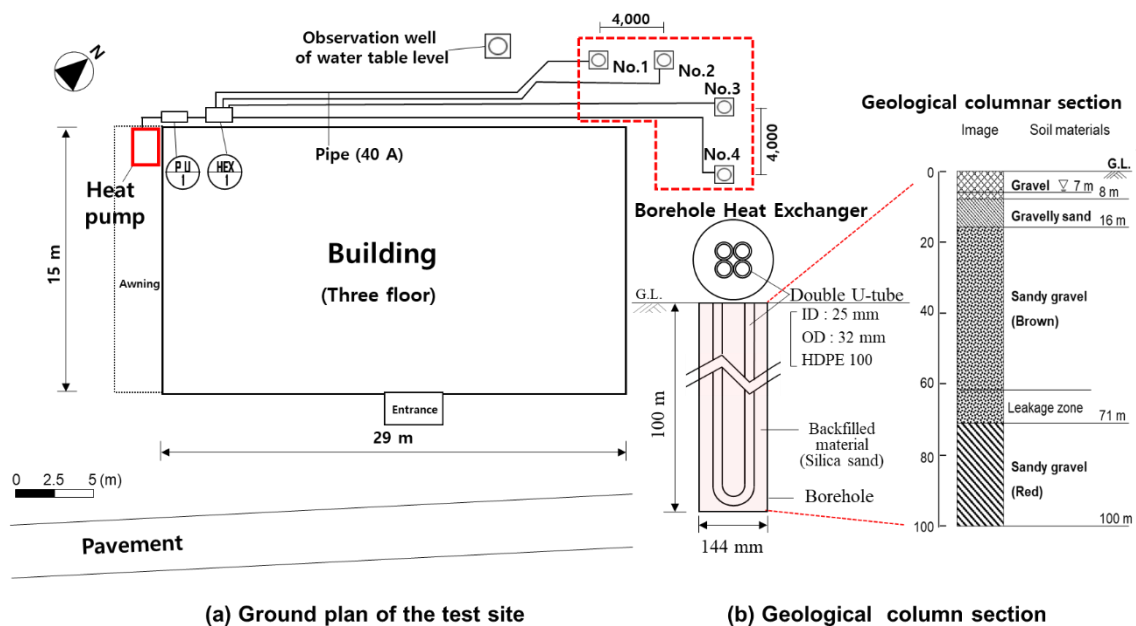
1 Site description; (a) ground plan of the test site, (b) geological column section
